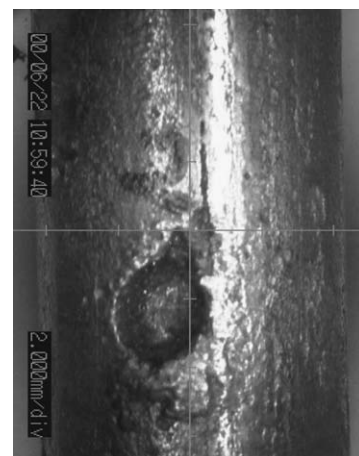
Pit over the steel bar (concrete mixed with seawater).
